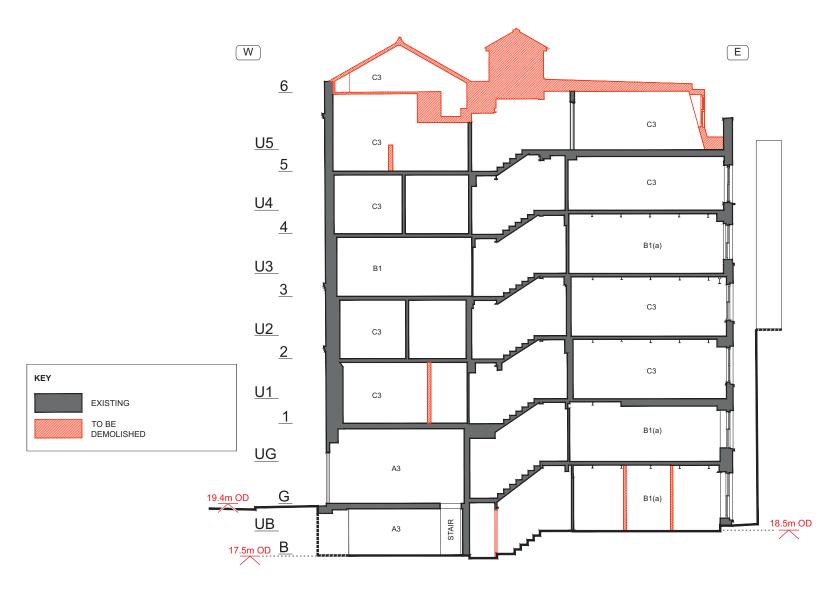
Existing south-facing section showing areas of proposed demolition (Smith Caradoc-Hodgkins Architects, project no. 723 DRWG no. A020. Rev. B dated 01-09-2016)
